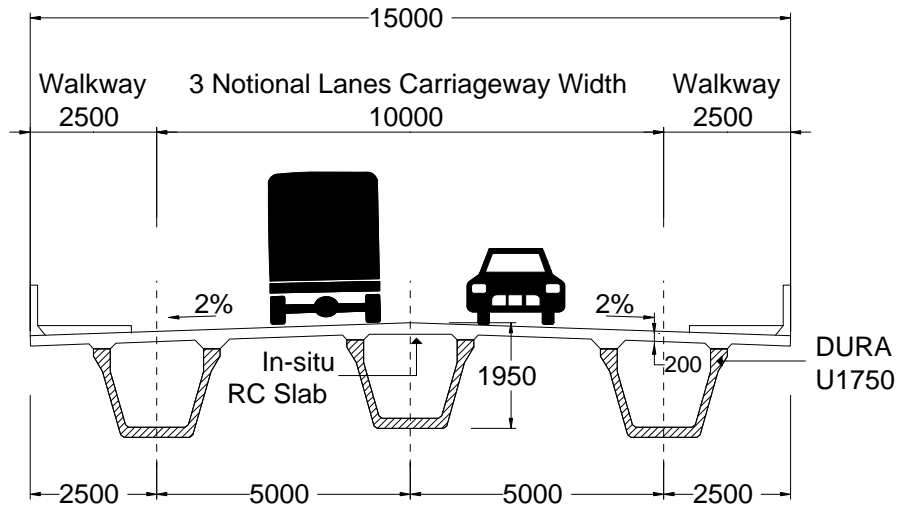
gives an example of a single span bridge with a total bridge span of 40 m and total width of 15 m. The proposed bridge consists of two 2.5 m wide walkways (parapet inclusive). The intermediate portion of the bridge consists of 3 notional lanes carriageway and is 10 m wide. If using Dura method, only THREE pieces of DURA[®] U1750BG are needed to composite with a 200 mm thick cast in-situ R.C. slab. The DURA[®] U1750BG are spaces 5 m apart c/c. In contrast, if using conventional method, seven pieces of the super tee girders are needed in order to has similar structural performance.
